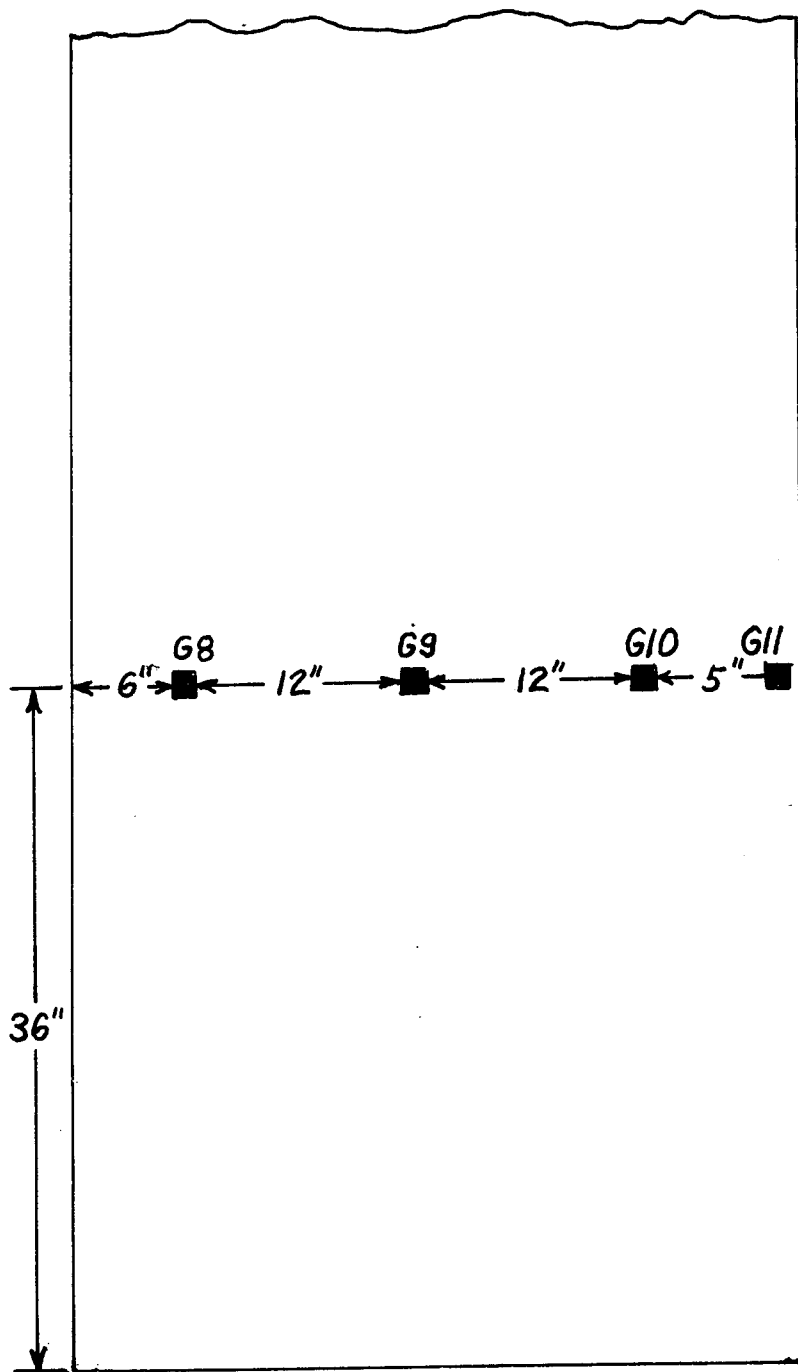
Strain Gage Configuration for Honeycomb Sandwich Units, Lower Surface
